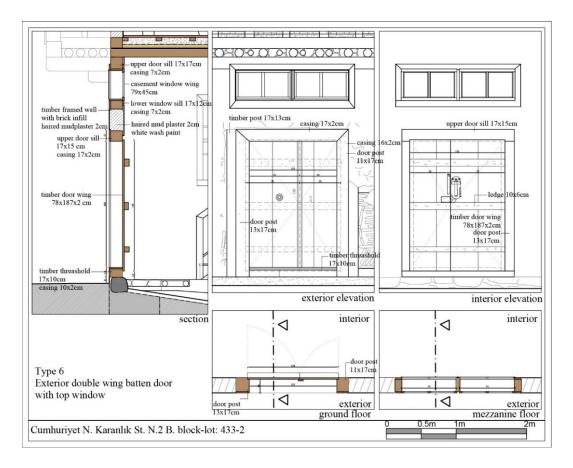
Drawing of exterior double wing batten door with top window located on timber framed wall, Type 6 (Cumhuriyet N. b. block-lot: 433-2)
